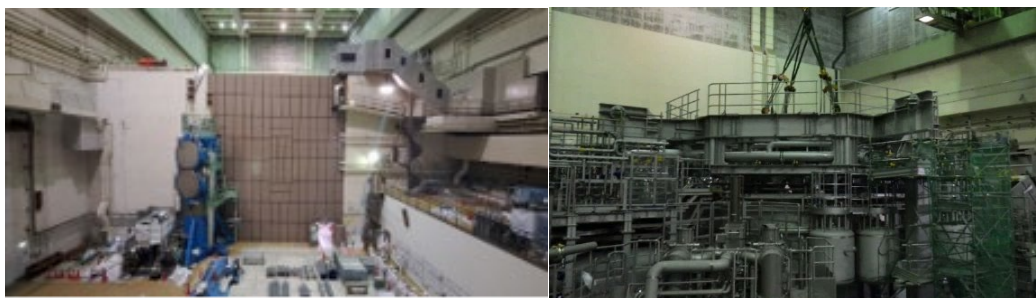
The Y3 shielding wall completed (left) The upper stage being installed (right)
